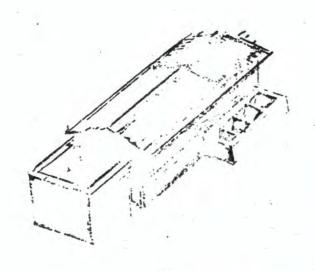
Building SE as it appeared in July 1969. The roof has now been extended over the room on the south end.
